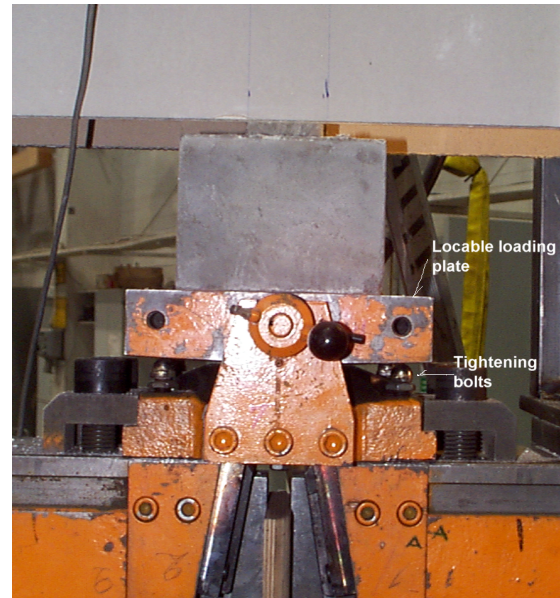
Test specimen in gypsum board braced column tests.
